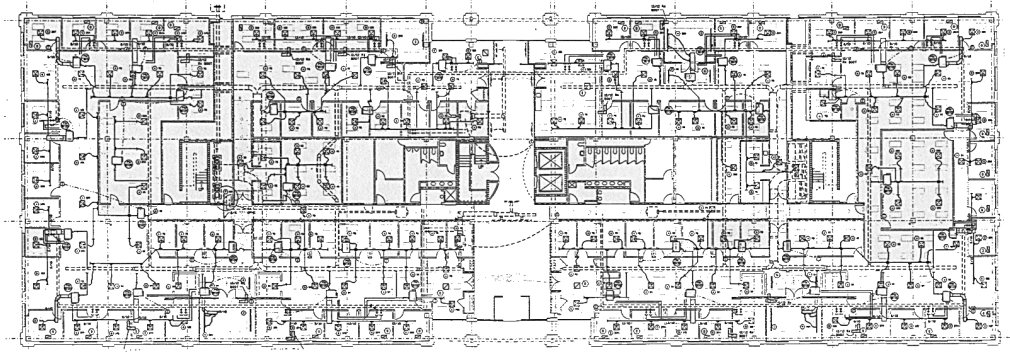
Ground floor mechanical plan of the DMS office building; illustrative of the complexity of HVAC systems in this scale of building.
